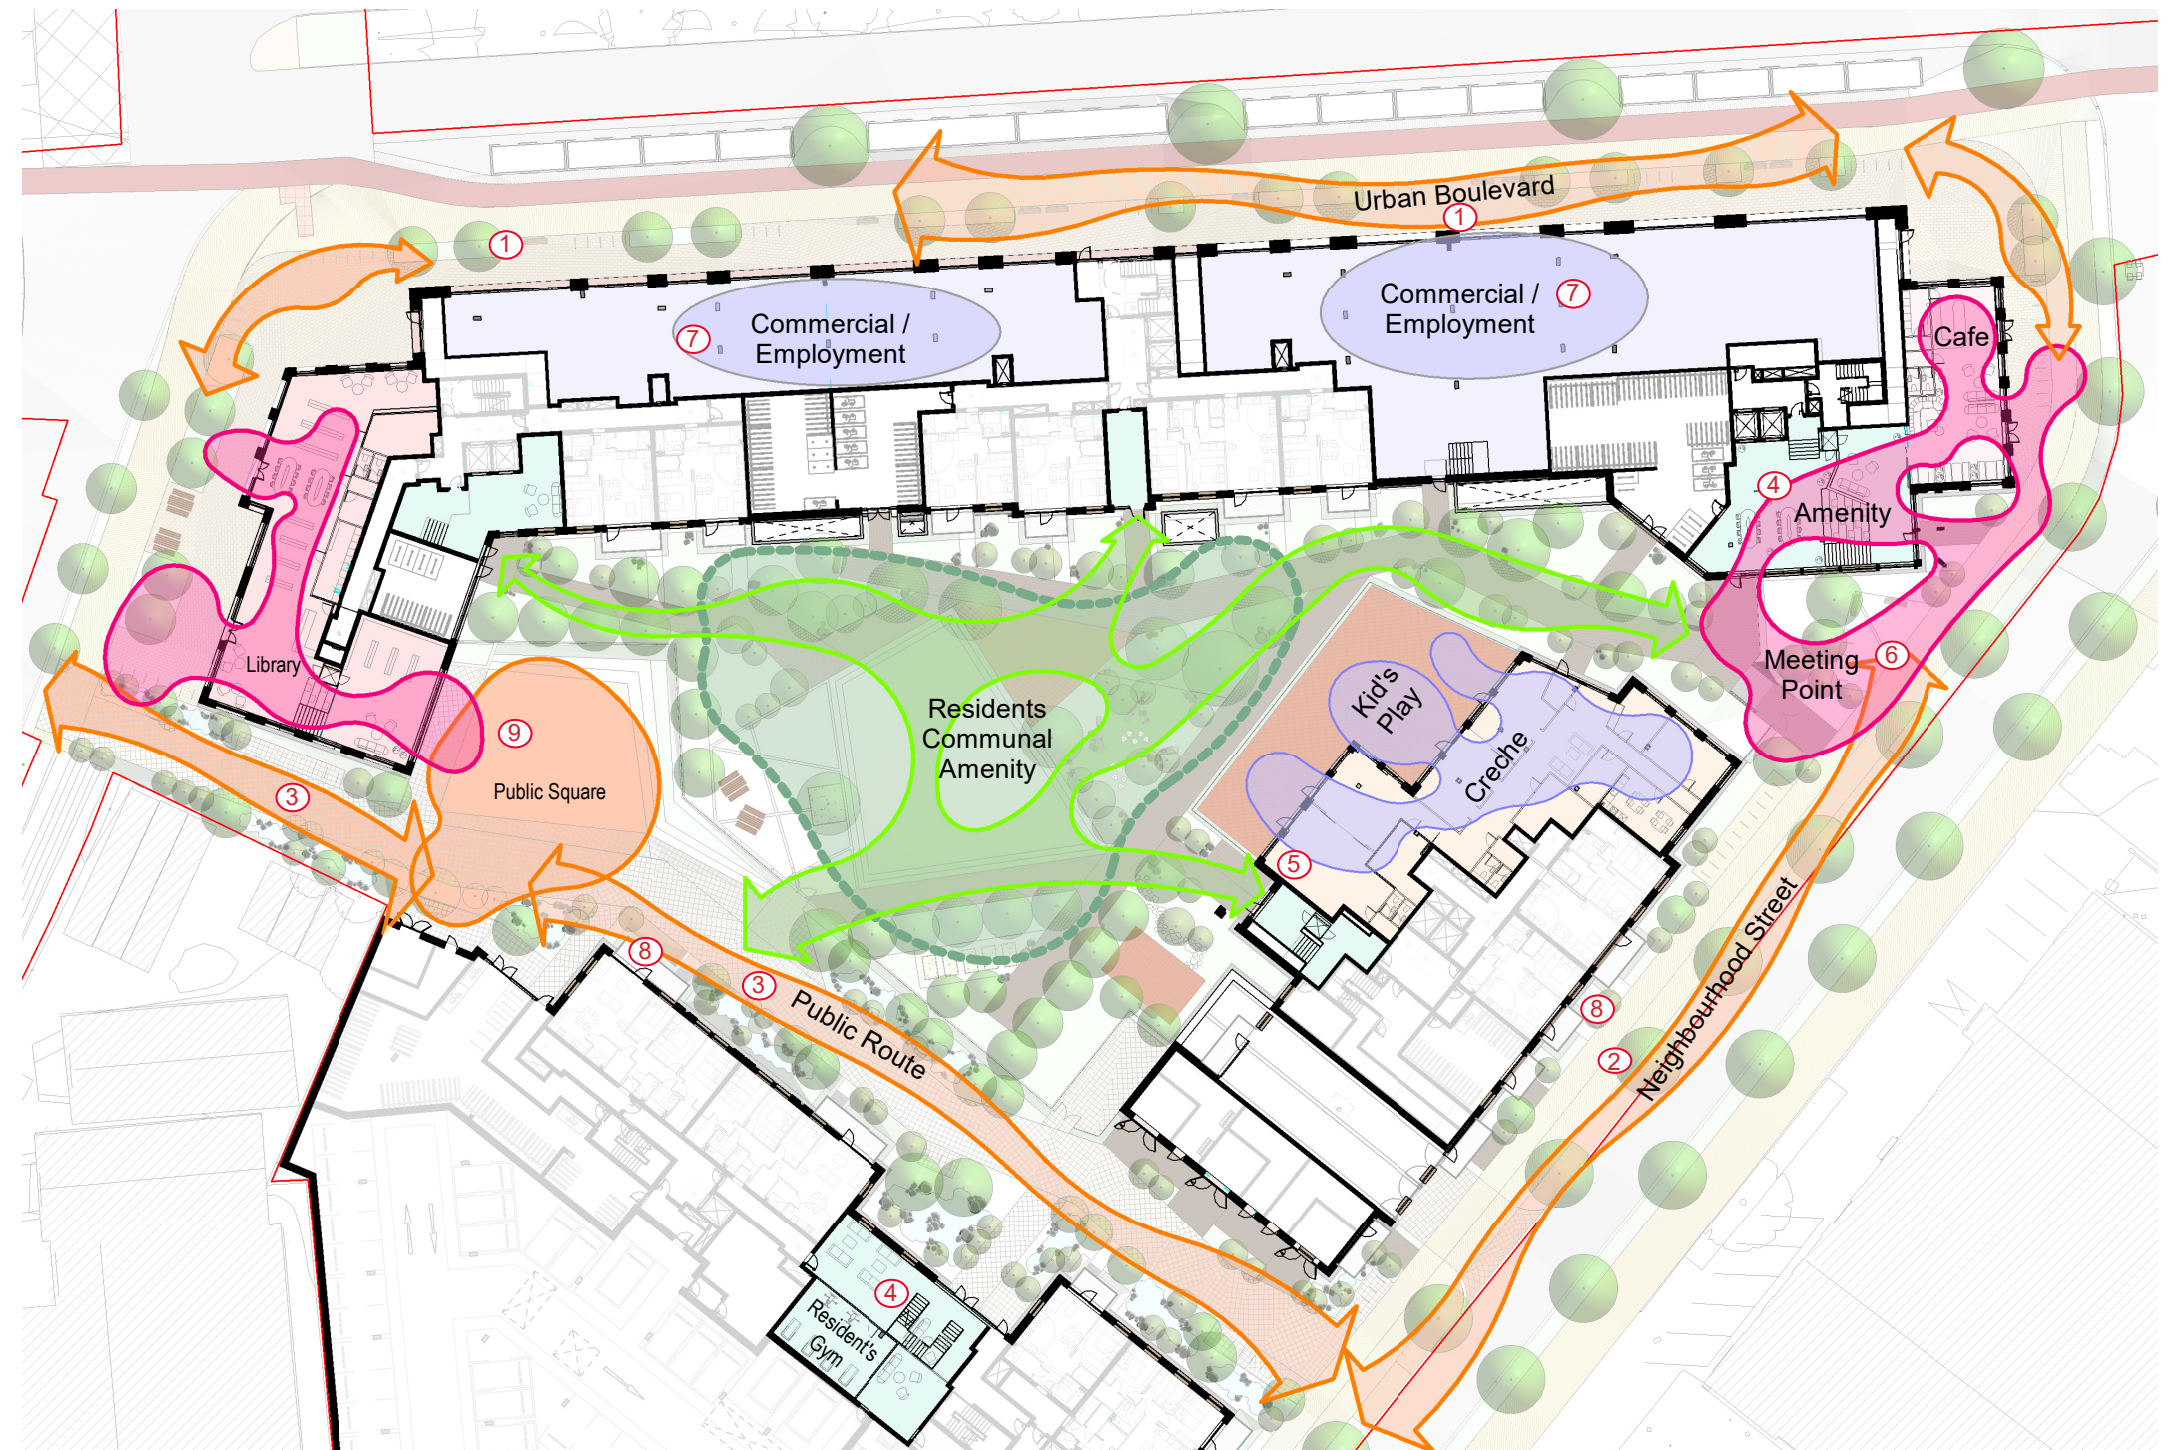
Ground Floor plan showing the proposed residents internal amenity spaces at that level
